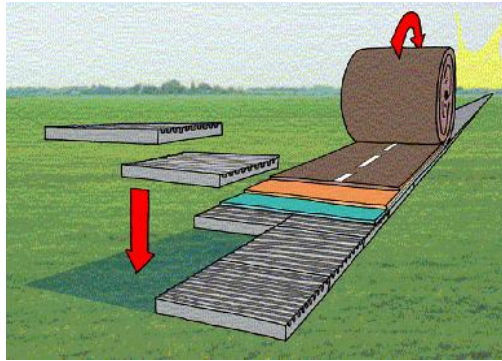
Example of a prefabricated modular road surface (Pictures courtesy of DWW)
